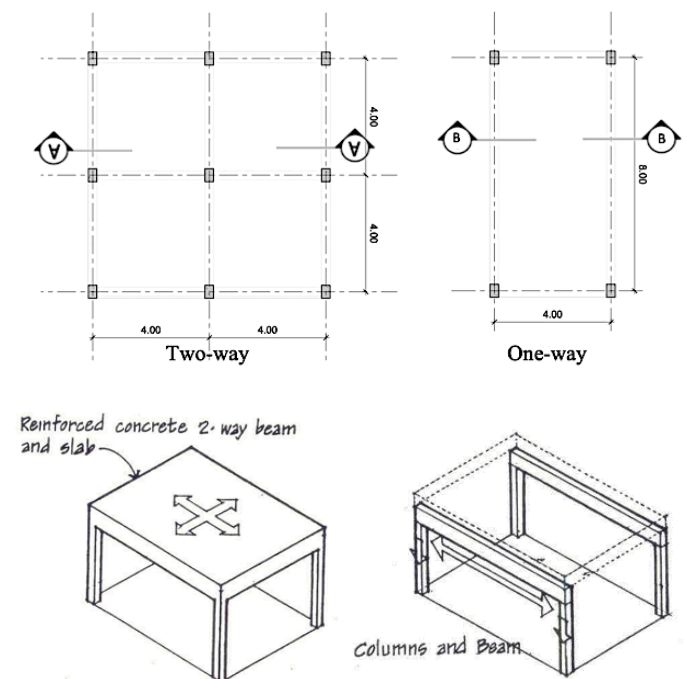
Structural plan and 3D presentation of one-way and two-way slab[13].
